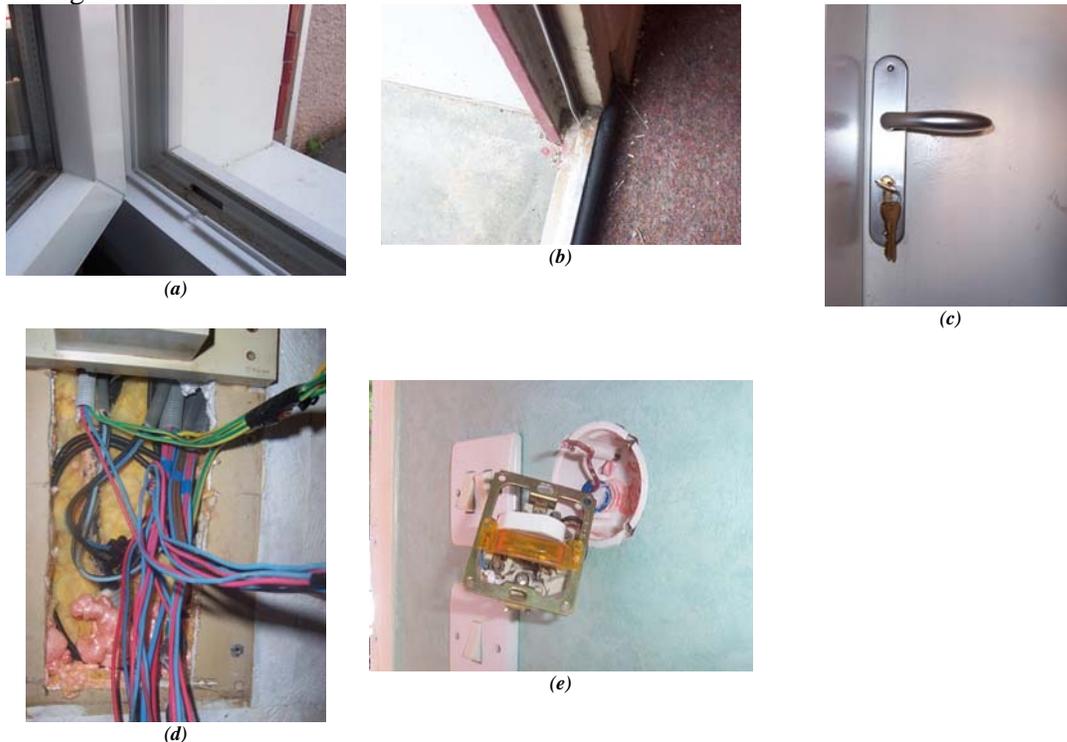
Examples of refurbishment measures. (a) replacement of windows. (b) Replacement of undercut joint and joint around the opening. (c) Replacement of the garage lock. (d) Injection of insulation foam to close the passageways to the air gap in the wall. (e) Insulation foam behind the plug boxes in cold walls.
